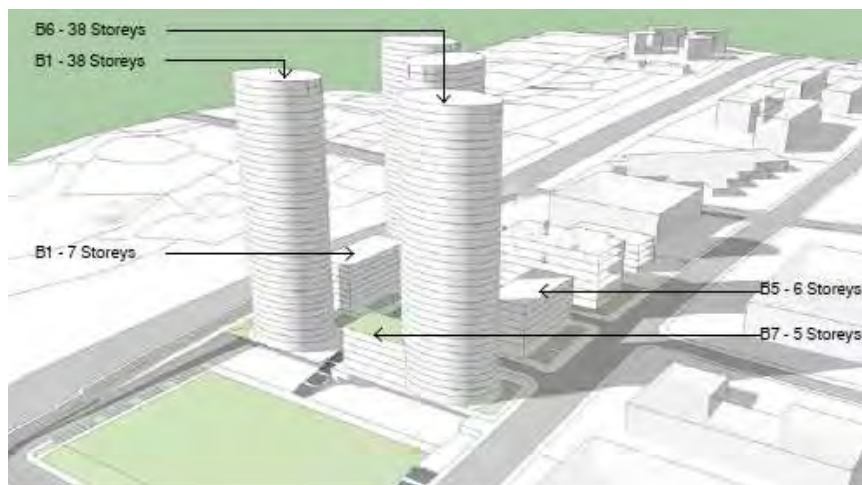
Proposed Tower heights in the context of the surrounding development (PP UDR pg 31)
